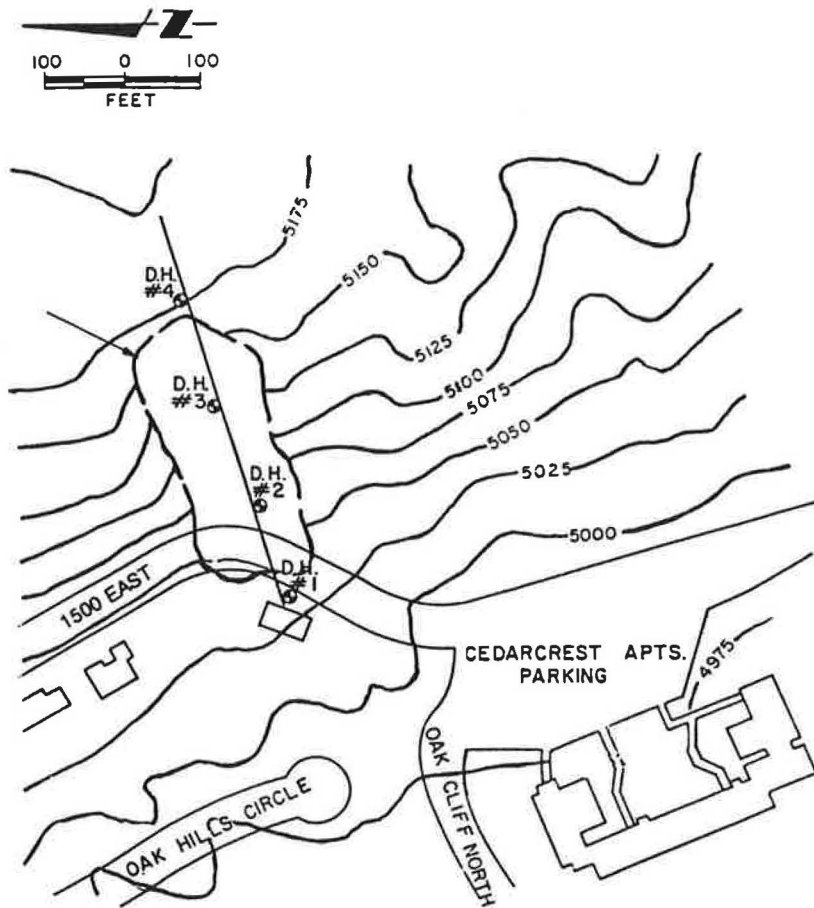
Plan view of Oak Hills slide and drillhole locations.
